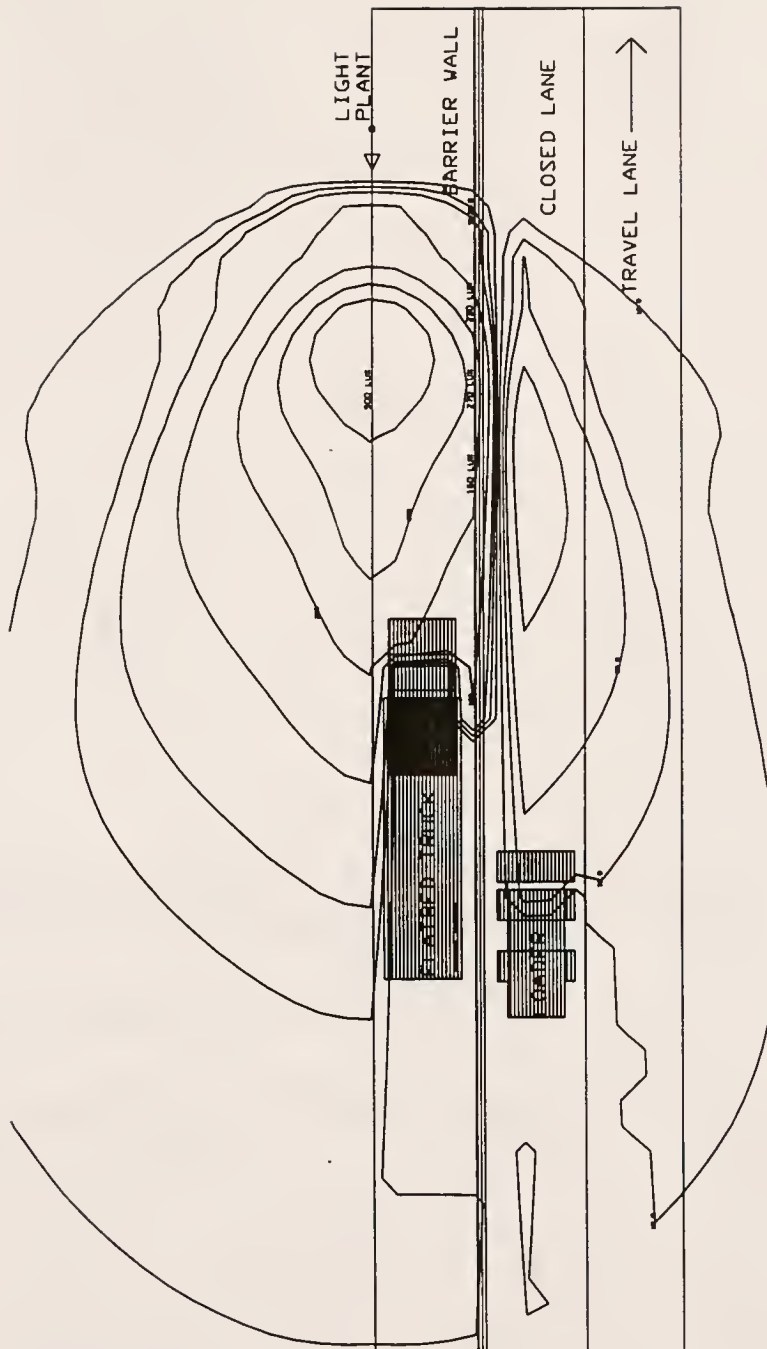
Plan Layout of Workzone (Case Study 1: Barrier Wall)
